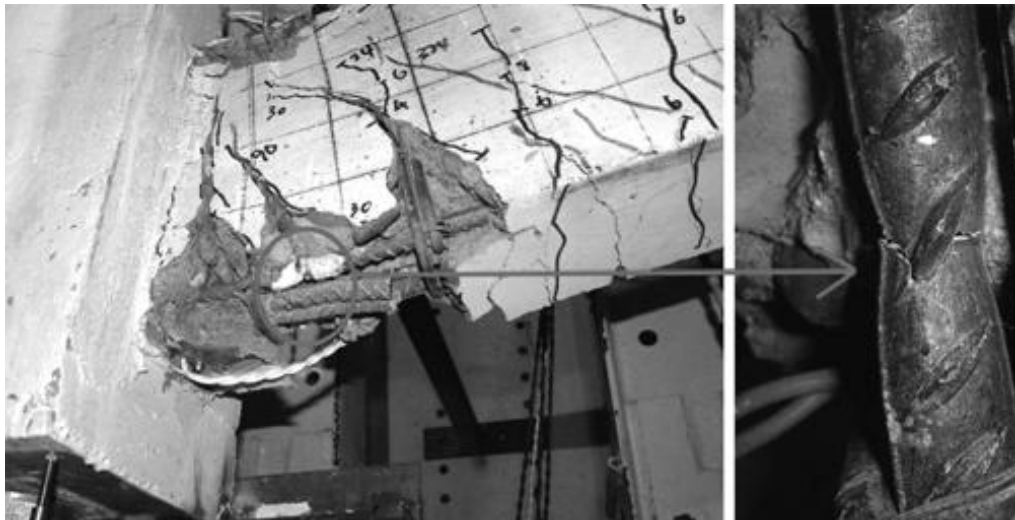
Failure of the frame and detail of steel rupture in beam close to connection (Yi et al. 2008).
